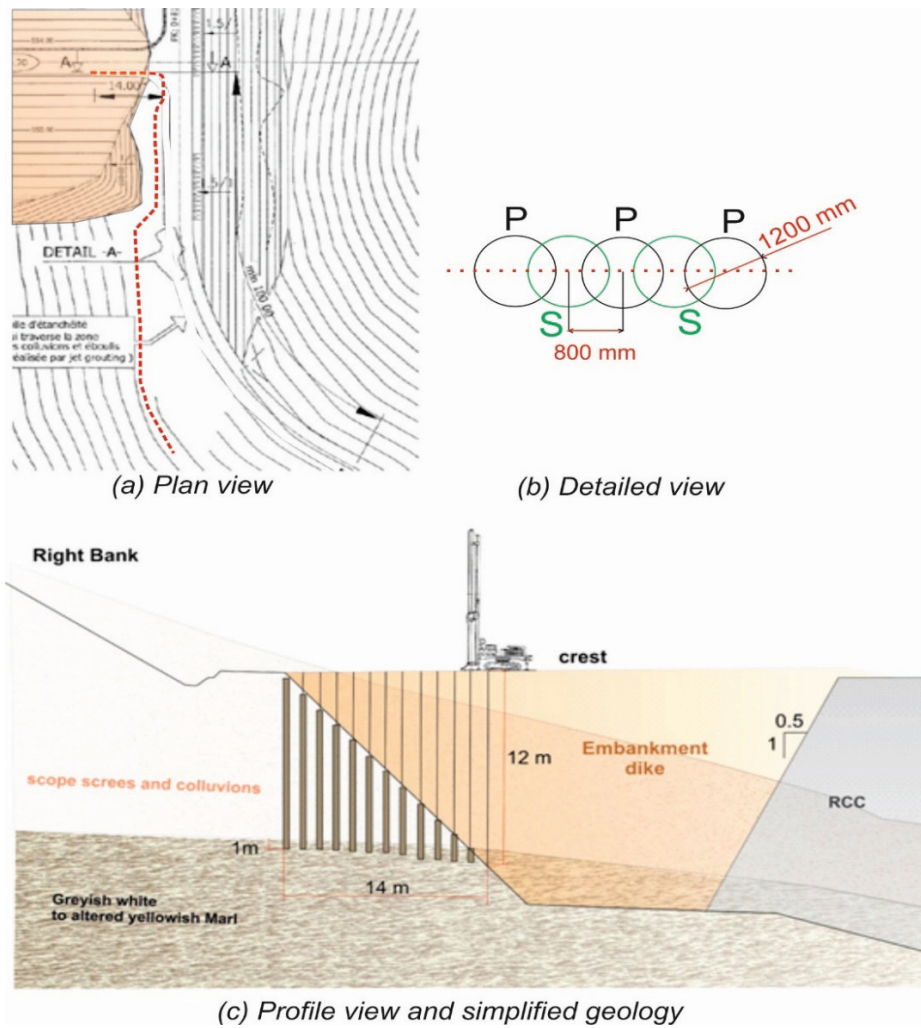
The jet grouting cutoff wall: (a) Plan view, (b) Detailed view, (c) Profile view and simplified geology
